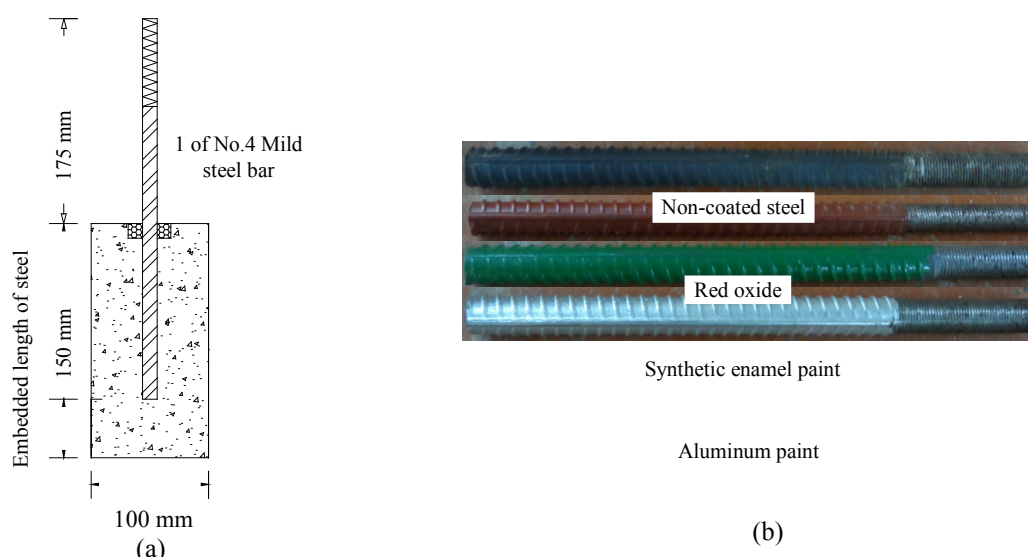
(a) Details of test specimen, (b) general view of color coating on steel
